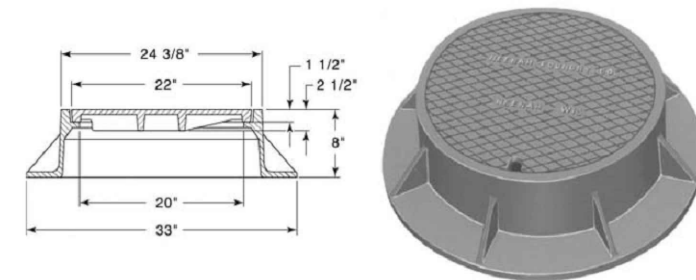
DETAIL FOR COMPUTING ROUND STRUCTURE ELEVATIONS
